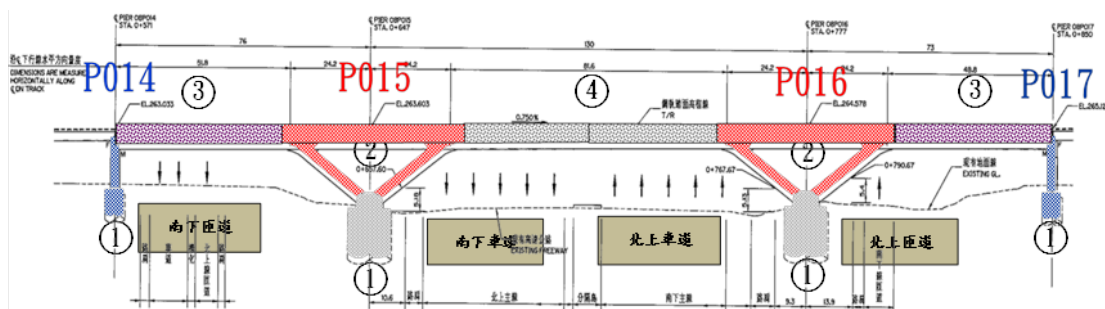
V-type bridge—The concept of construction procedures for stayed support method
